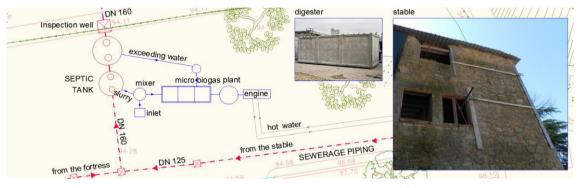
The layout of the plant, integrated to the sewerage piping system
